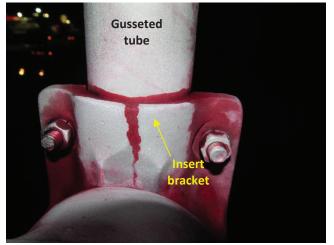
Crack in insert bracket at gusseted tube connection on orbital bracket
